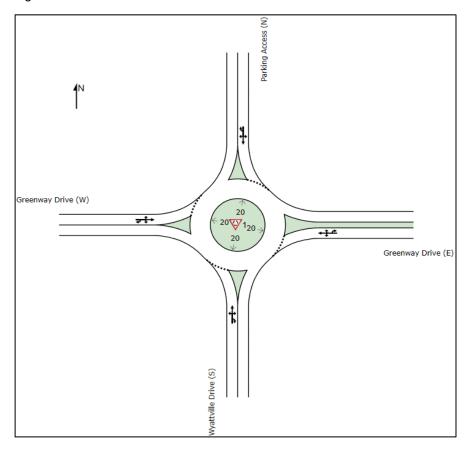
Greenway Drive / Wyattville Drive / Parking Access roundabout SIDRA layout
